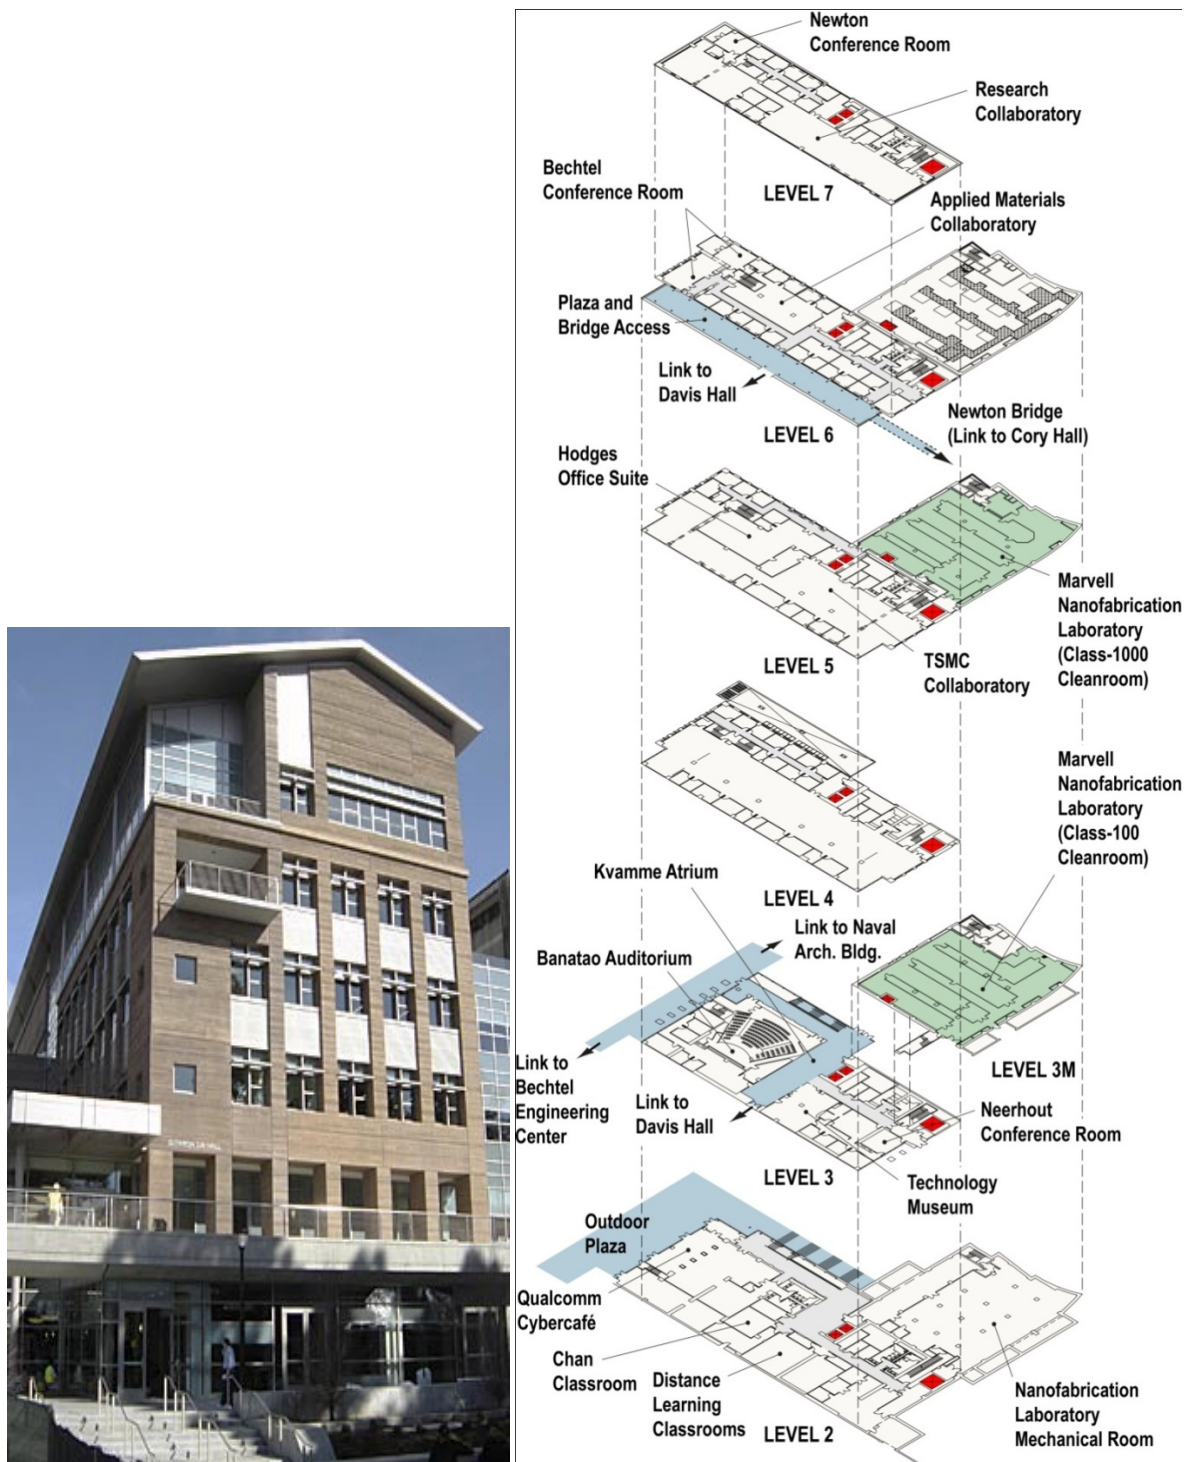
Left: West facade of Sutardja Dai Hall; Right: schematic of building uses.
